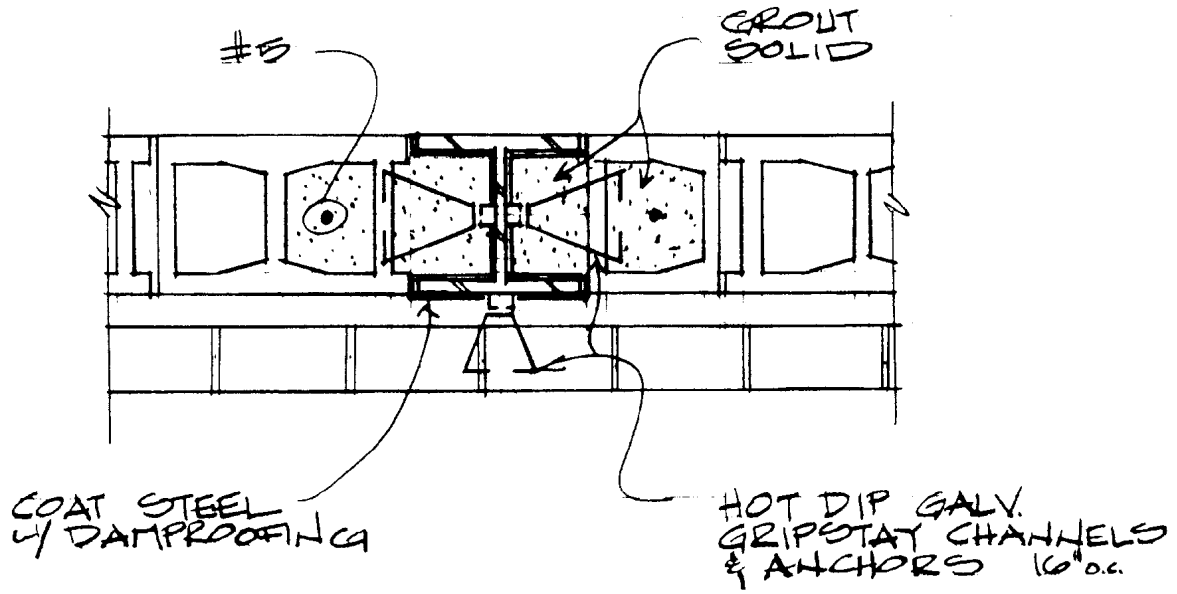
Structural steel column anchors. Channel slot type anchors are preferred for anchorage of masonry to steel.
